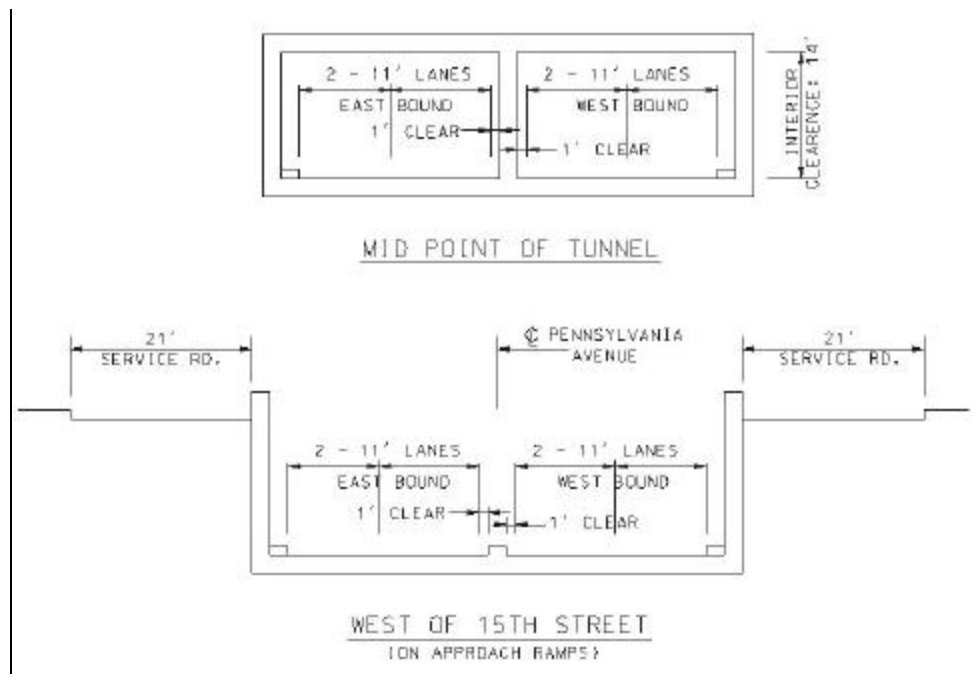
Preliminary Short Tunnel Cross-Sections
